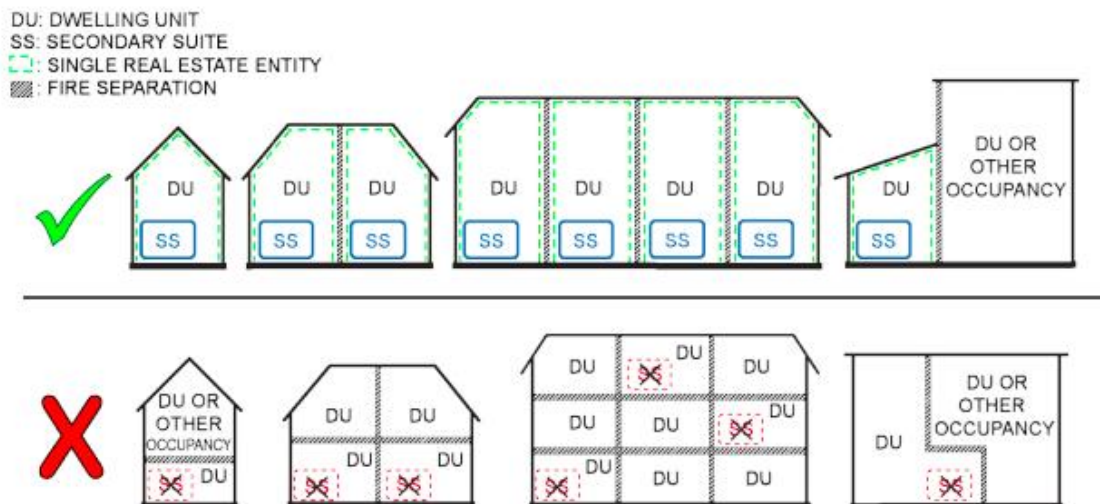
Building Types where Secondary Suites are permitted – from BC Building Code
